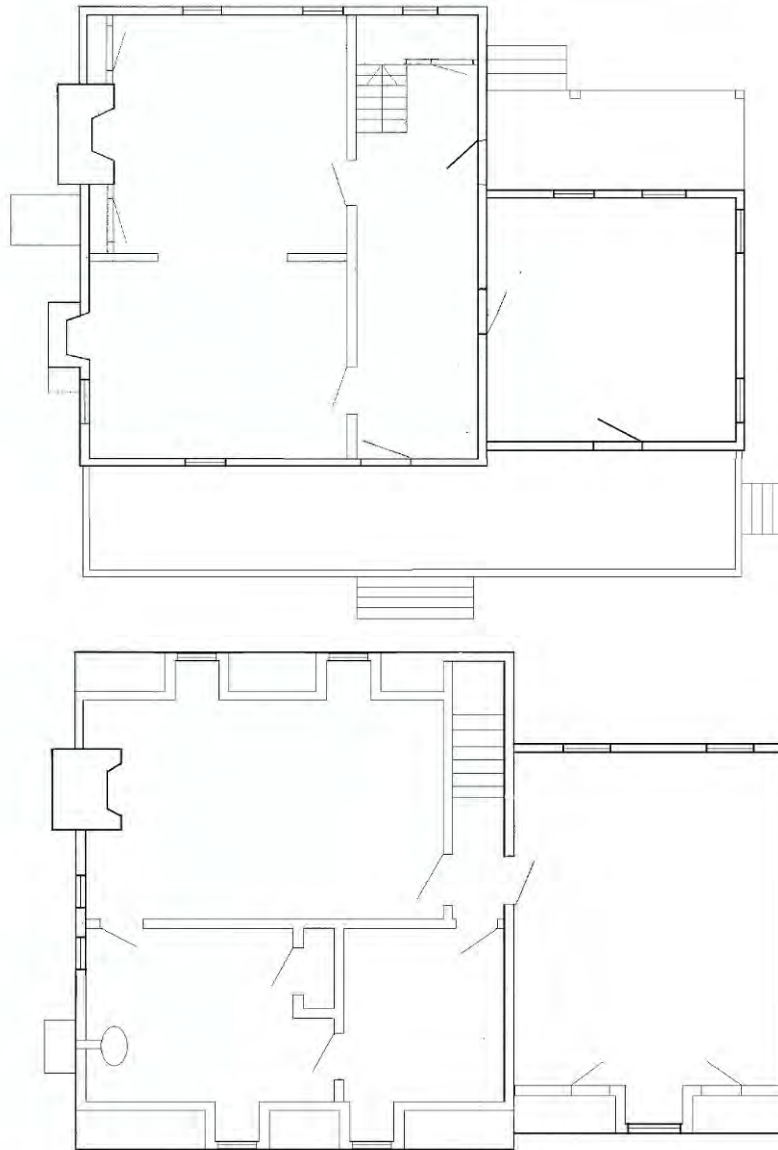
Conjectured layout during Francis ownership, first floor (Top) and second floor (Bottom).
